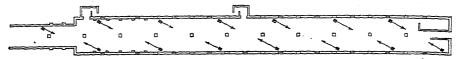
Typical layout of unit heaters in long rectangular type of workshop or factory
